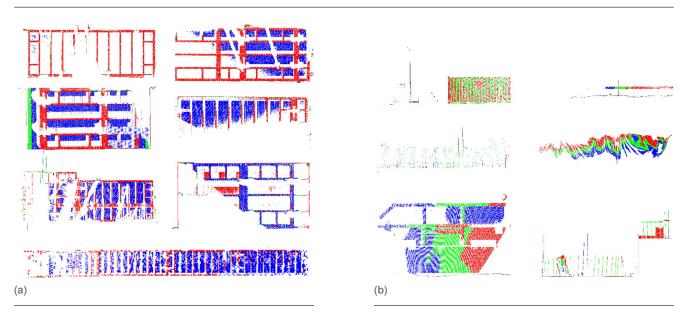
Subset of vertical cross-section used to train a CNN to classify formwork: (a) formwork; (b) non-formwork examples.
